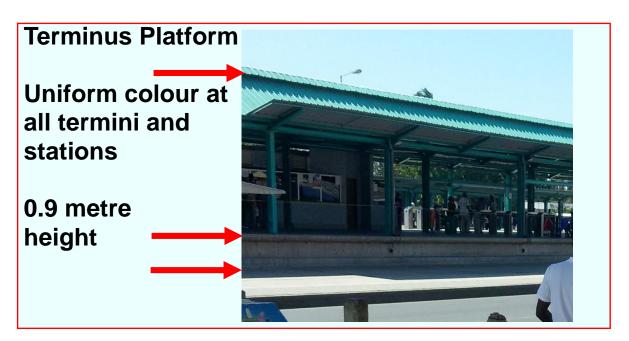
Example of BRT Platform with raised floor for exclusive use of BRT passengers (DAR)
